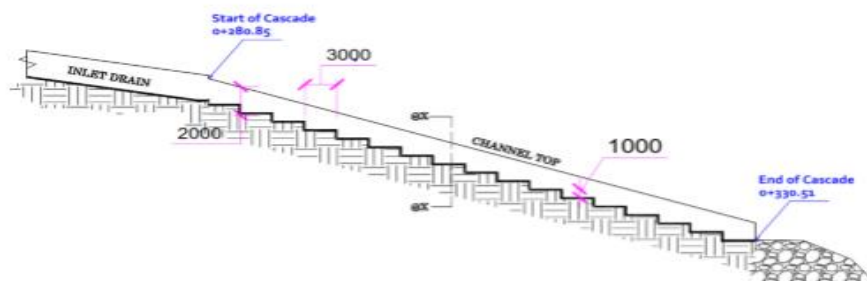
Cascaded channel (Iguosa FHA Engineering Design, December 2019)
